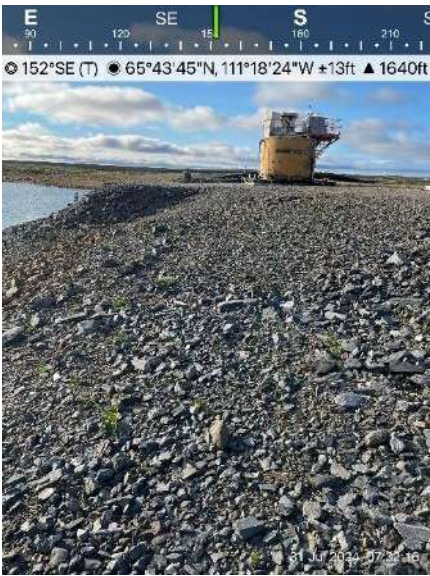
Overview of the Dam 1A crest and upstream embankment.
